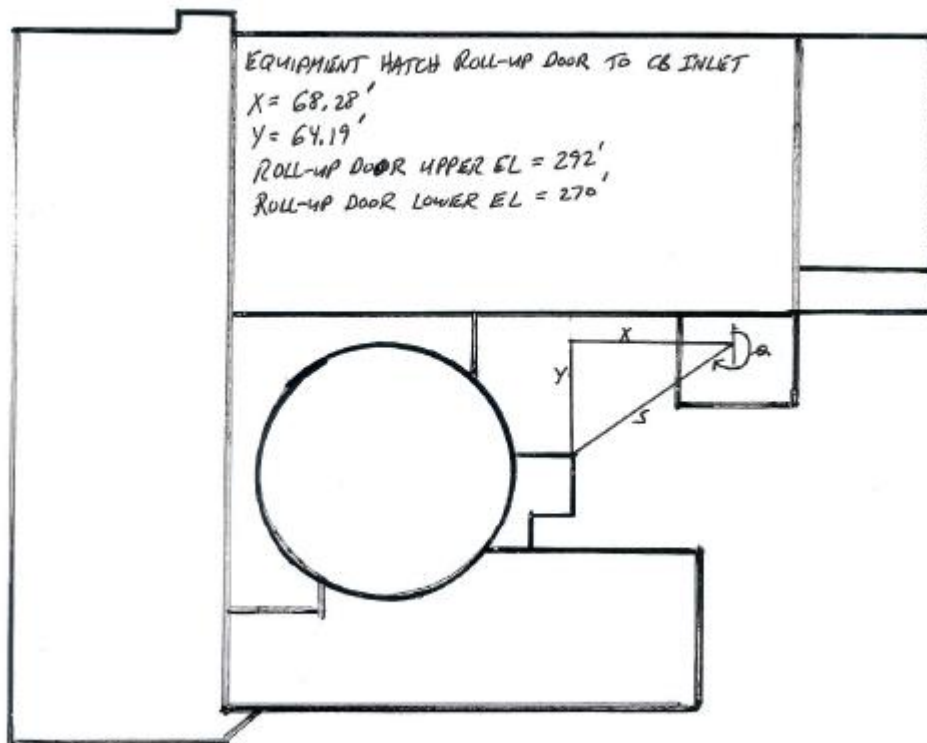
Equipment Hatch Roll-Up Door (Point Source) to Control Room Inlet
